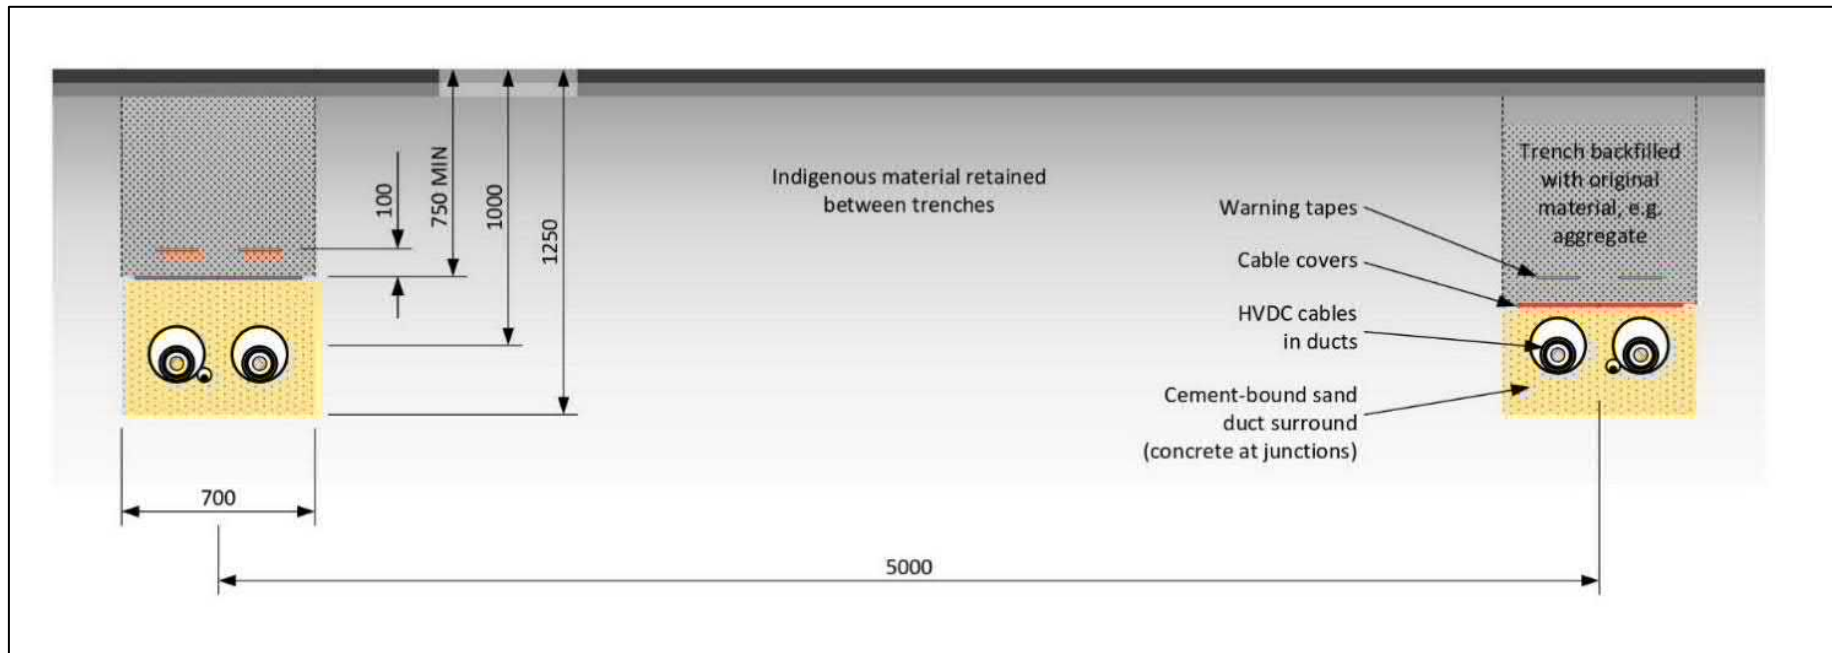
Typical arrangement of HVDC and FOC cables in roads, verges and footpaths (all measurements in mm)
